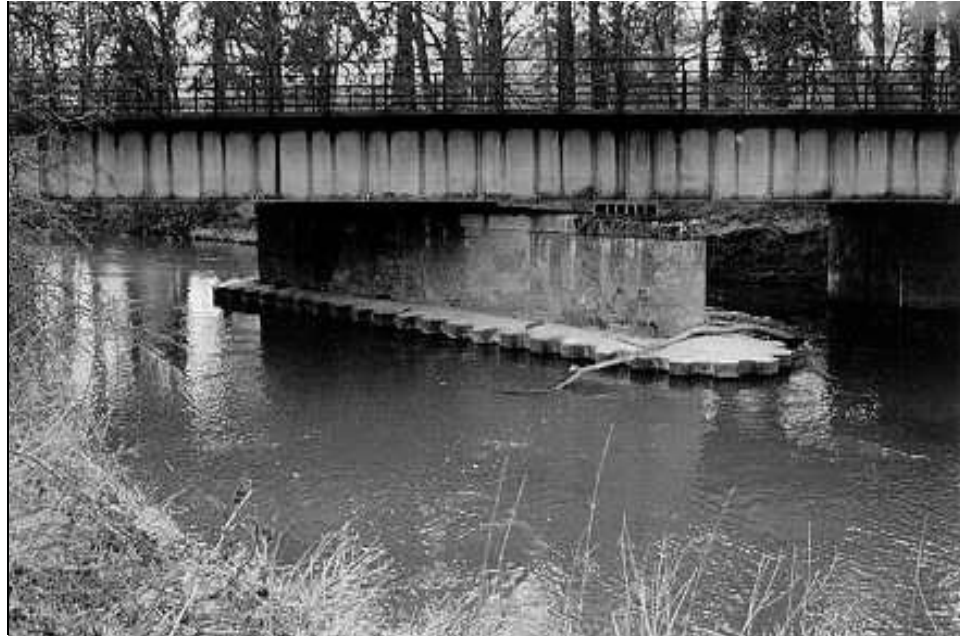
Cil-Cewydd railway bridge (photograph courtesy of WS Atkins Ltd)
